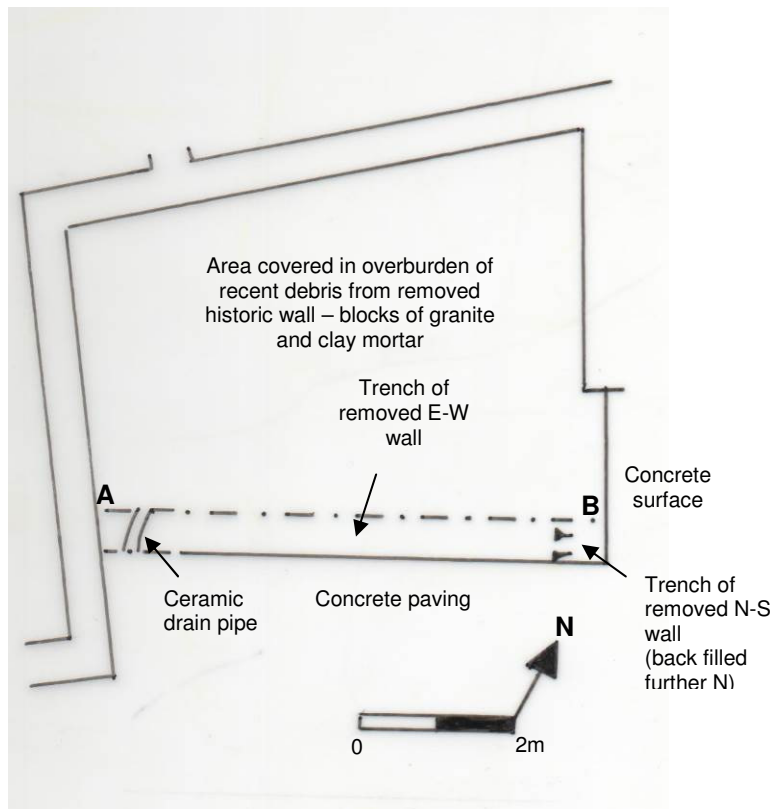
Plan of site showing trench of removed wall and drawn section, A-B (Sept 2013)
